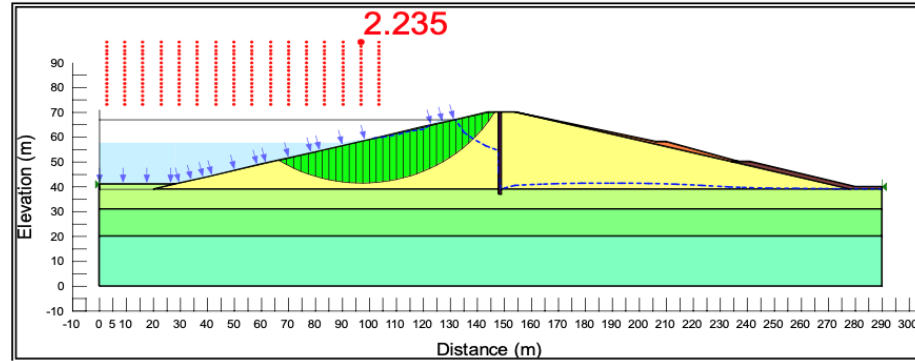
Slope stability using Bishop's method at water level 20 m in Dau Tieng dam with cut off wall.
